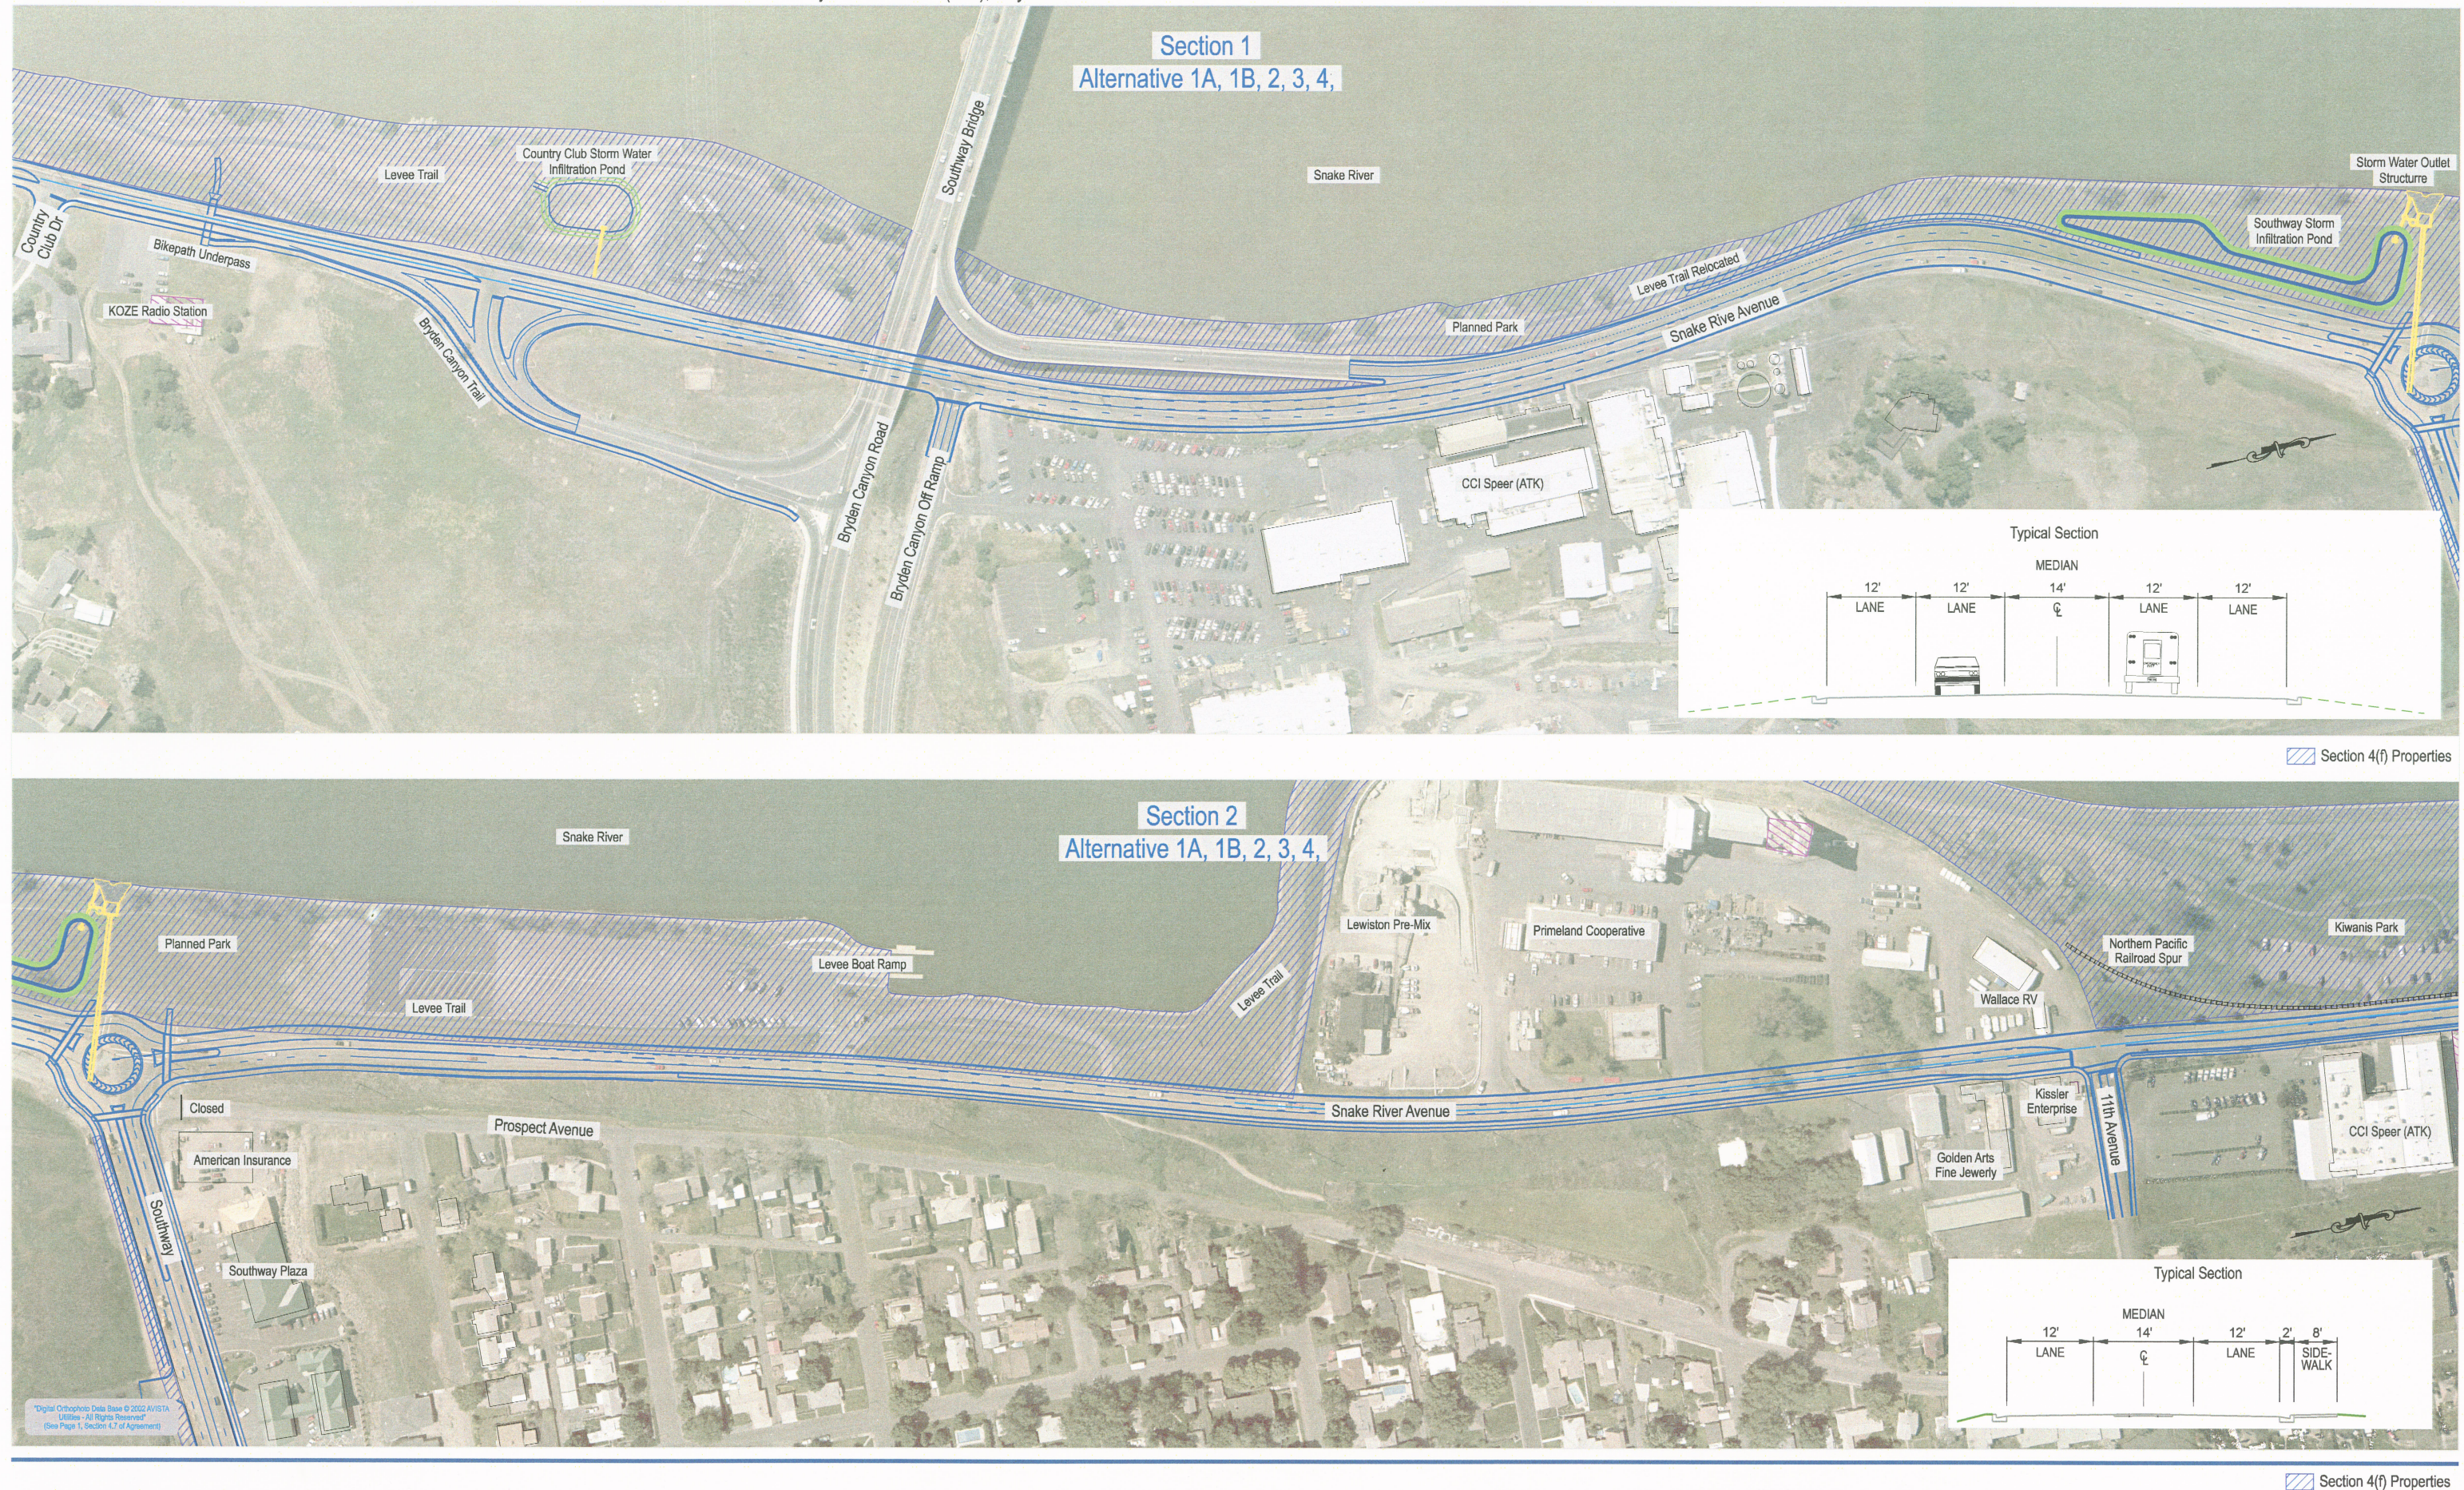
SECTIONS 1 & 2 FOR ALL BUILD ALTERNATIVES
